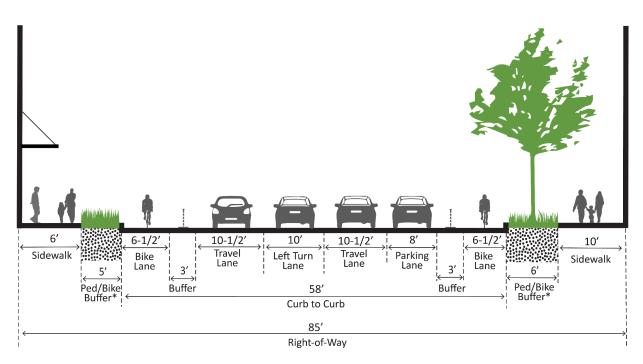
East-West Highway (M-20): Blair Mill Road to Blair Mill Way, Looking North
